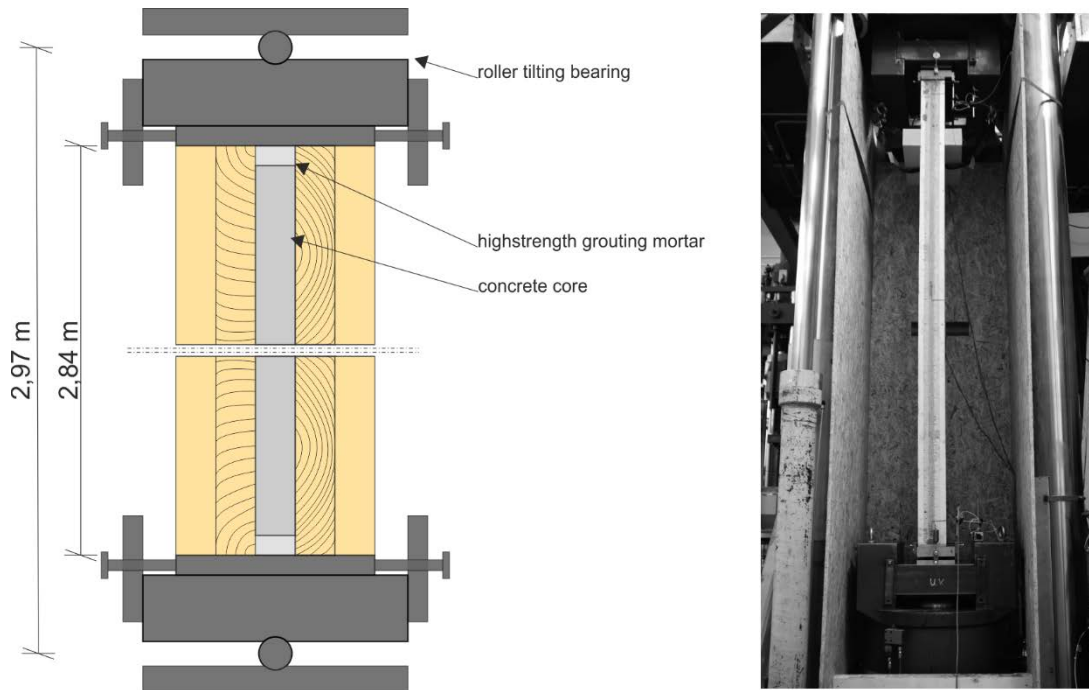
Schematic test setup of a centric (left) and real test setup of an eccentric (right) test of a wall segment
